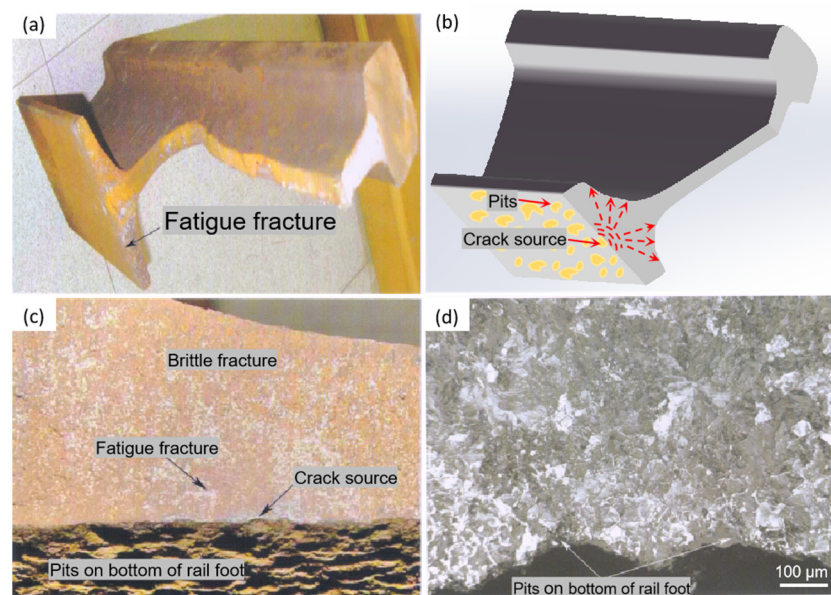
Fatigue fracture of the joint: (a) Fatigue fracture; (b) the schematic diagram of pits; (c) pits on bottom of rail foot; (d) metallographic structure around pits.
